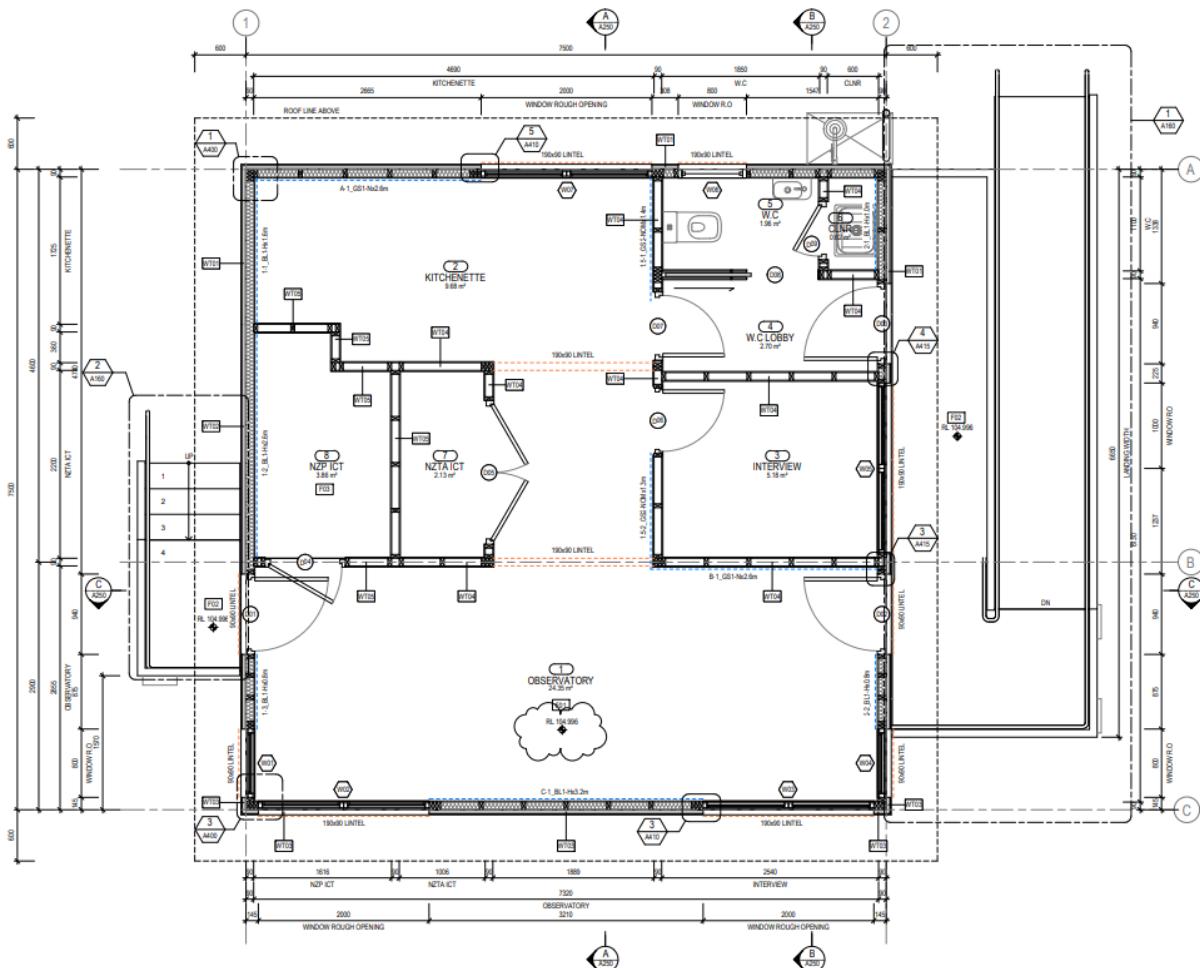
Internal layout of Tier 1.5 Compliance Building. (Source: GHD Woodhead)
